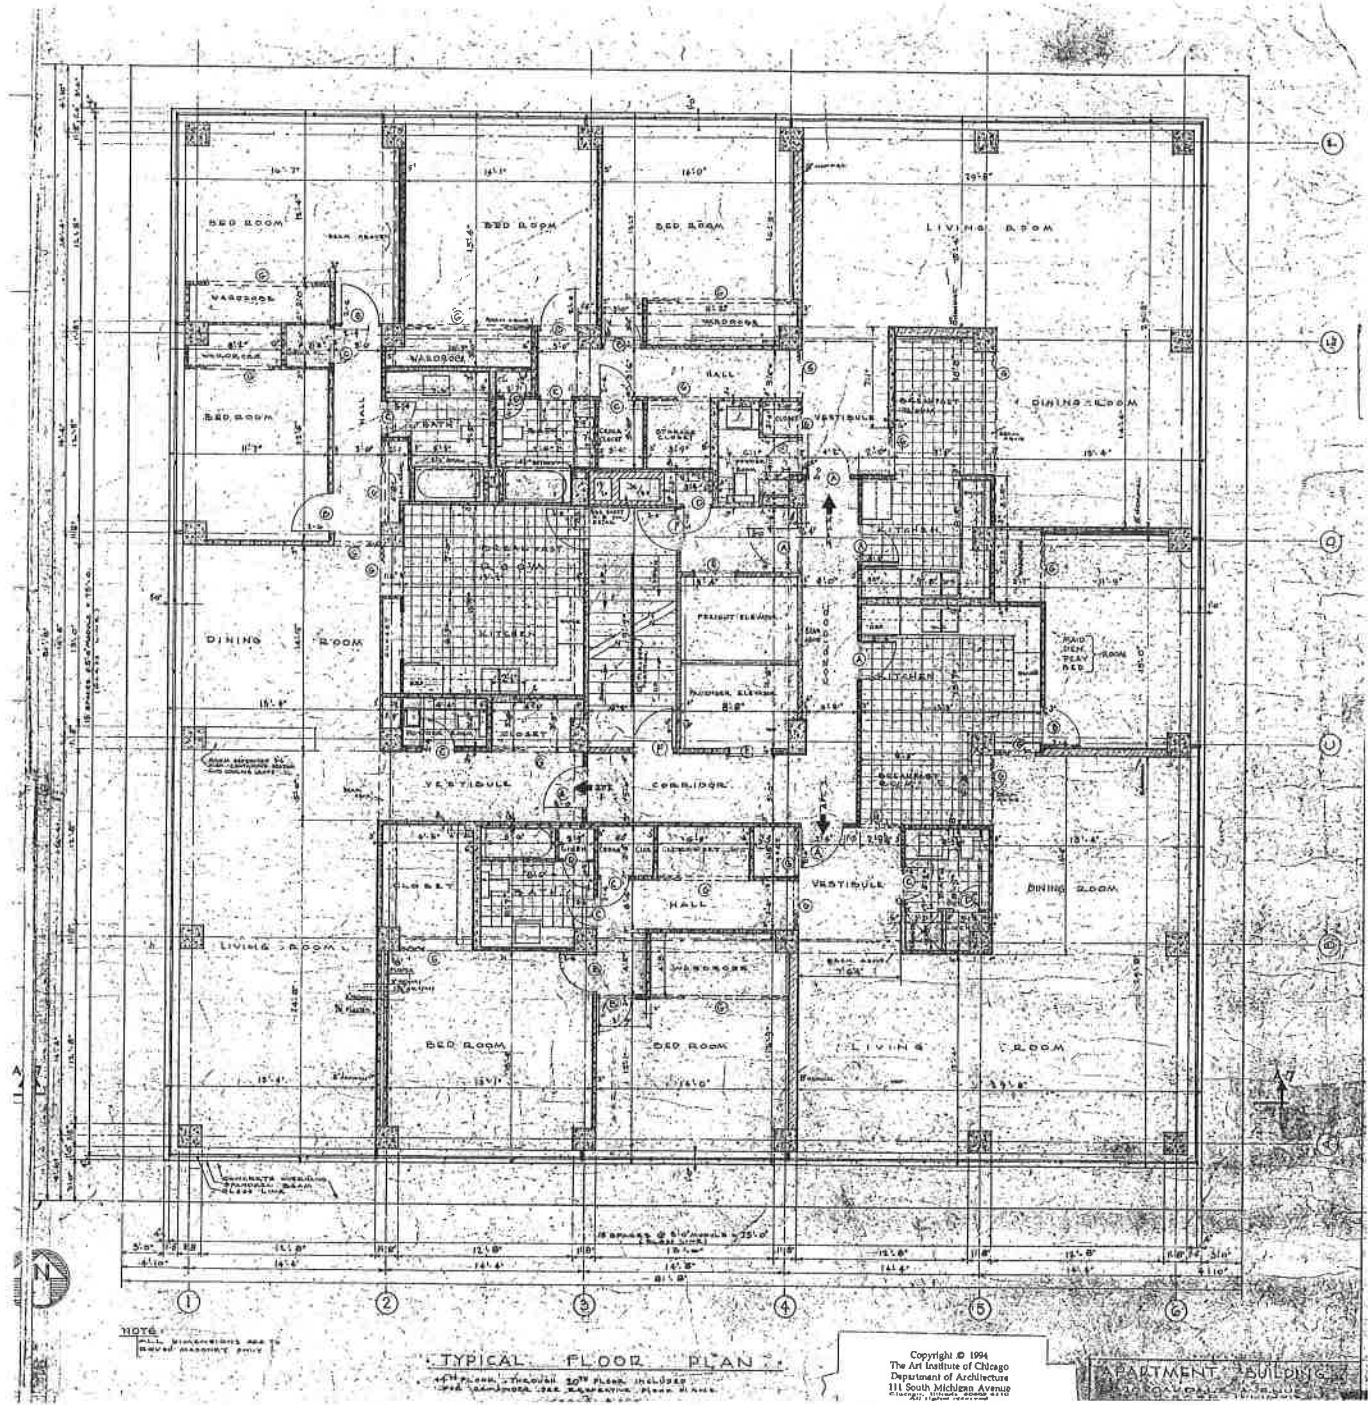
Typical Floor Plan, 320 West Oakdale Avenue, c. 1953-55. Collection of the Art Institute of Chicago, Department of Architecture and Design. Gift of Milton M. Schwartz, the architect.
